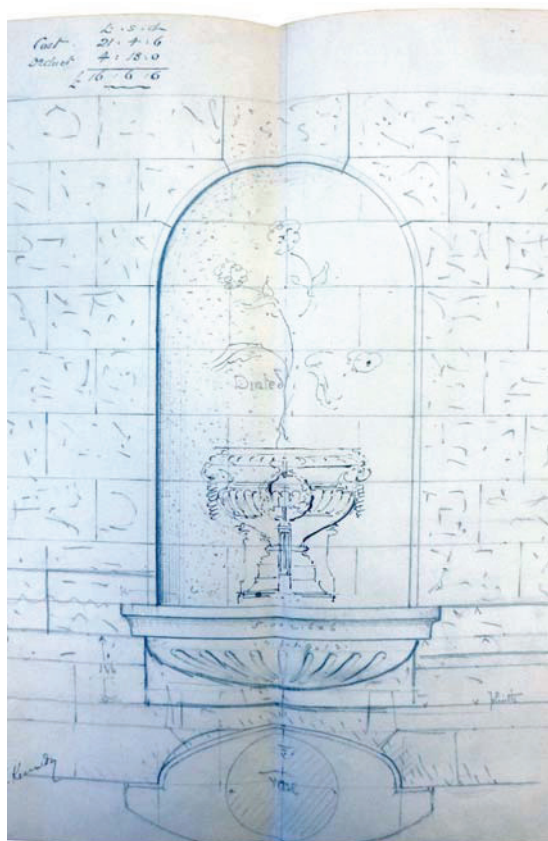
Proposed elevation and cross-section of new alcove in north elevation of Fair View, 1889
